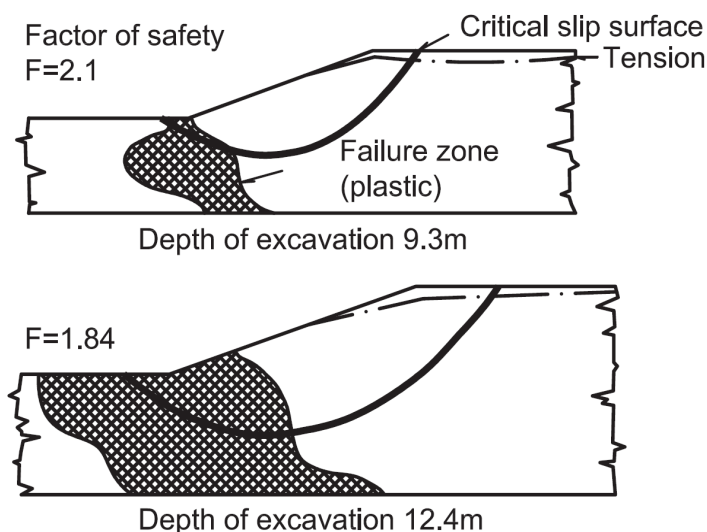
Development of failure (plastic – tensile) zone during the process of excavation.
